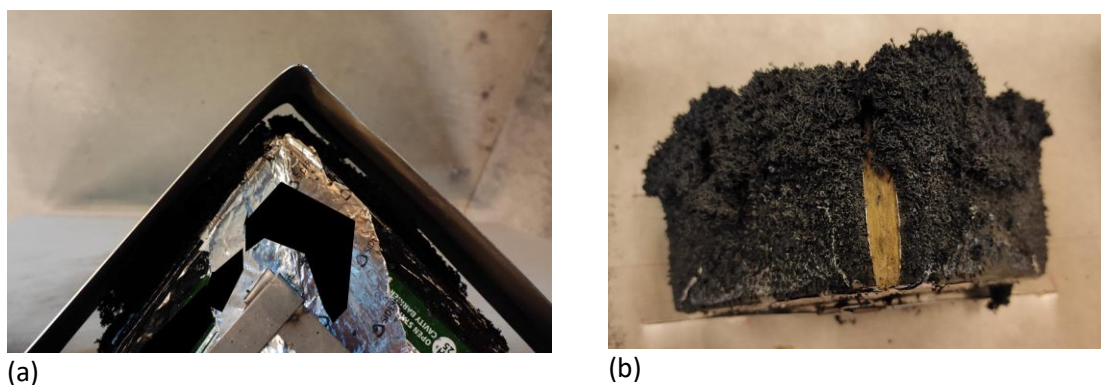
The OSCB after the test for the scenario 7 (a) top view (b) front view
